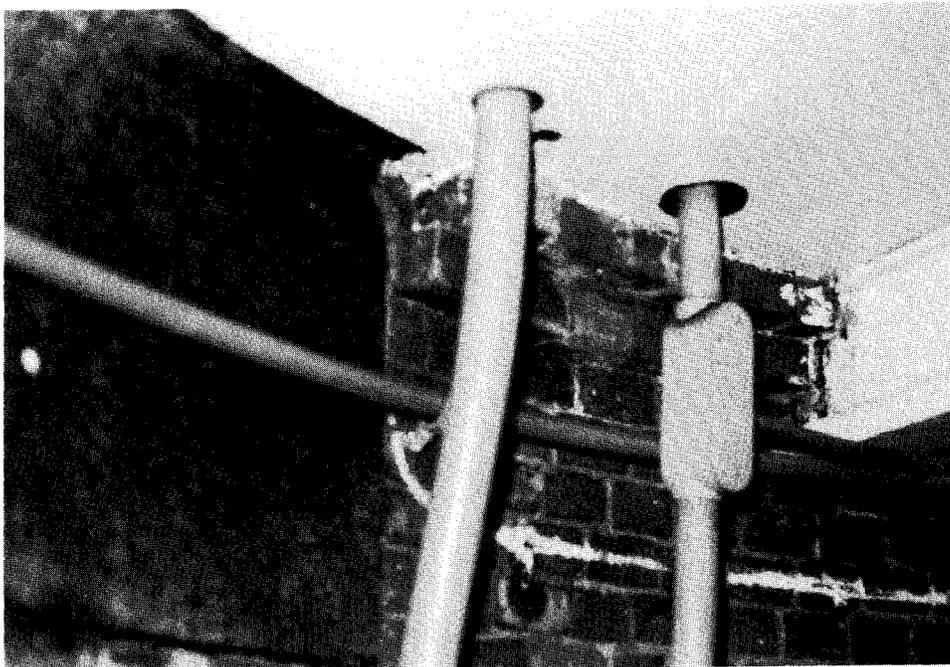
Room 112, granite sill of exterior Watch Deck doorway (above) interrupting corbeling of Weight Deck.
